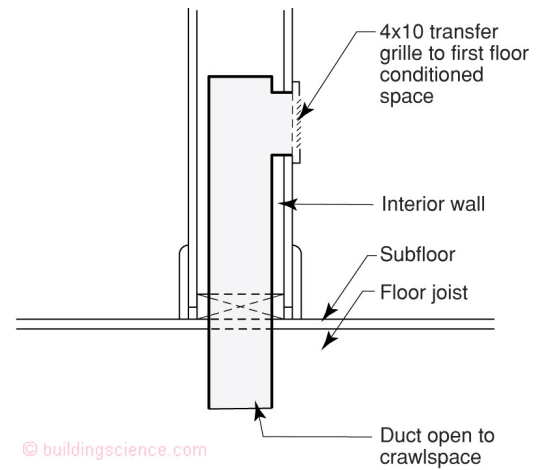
Transfer Grille – Best location is in an interior wall thereby avoiding floor grilles that can be blocked with furniture and that can lead stuff falling into crawlspaces.
